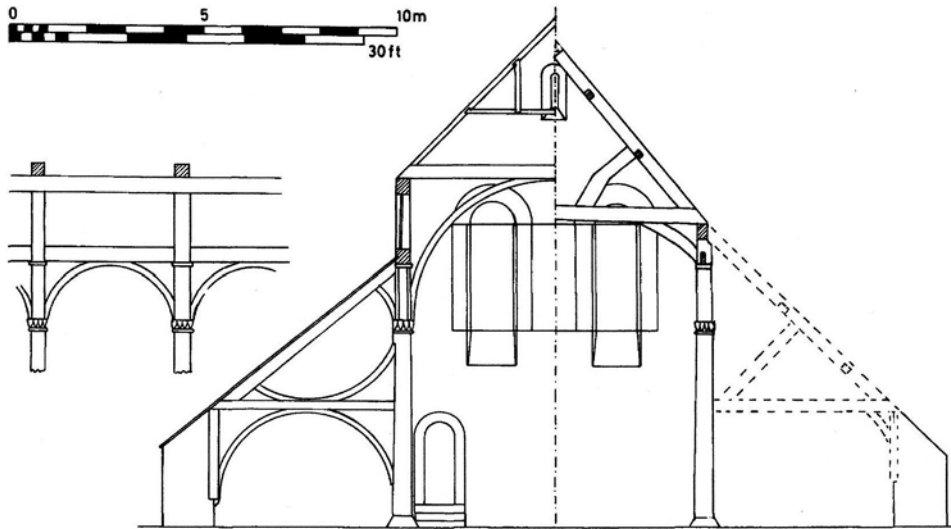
Alcock's cross-section of 1987: the pre-1821 section to the right and reconstruction as original to the left, with longitudinal section of arcade.
